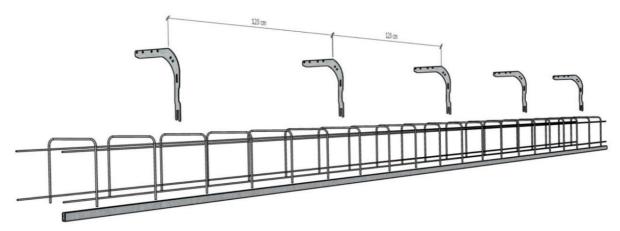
Reinforcement brackets (every 120 cm) and U-shaped reinforcement
